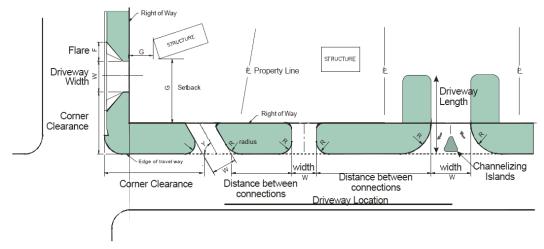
Typical Driveway Dimensions [FDOT Design Standards]
